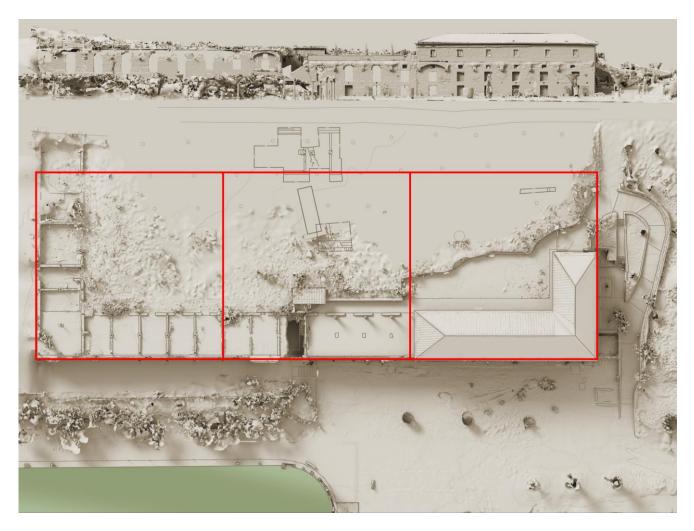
Rendering of the preliminary three-dimensional model of the building and surrounding area (plan and façade). In red, the 3 *actus* fitting the front perimeter wall of the *Antiquarium* and the western wall of the remains found with the excavation. Image credits: S. Bertacchi
